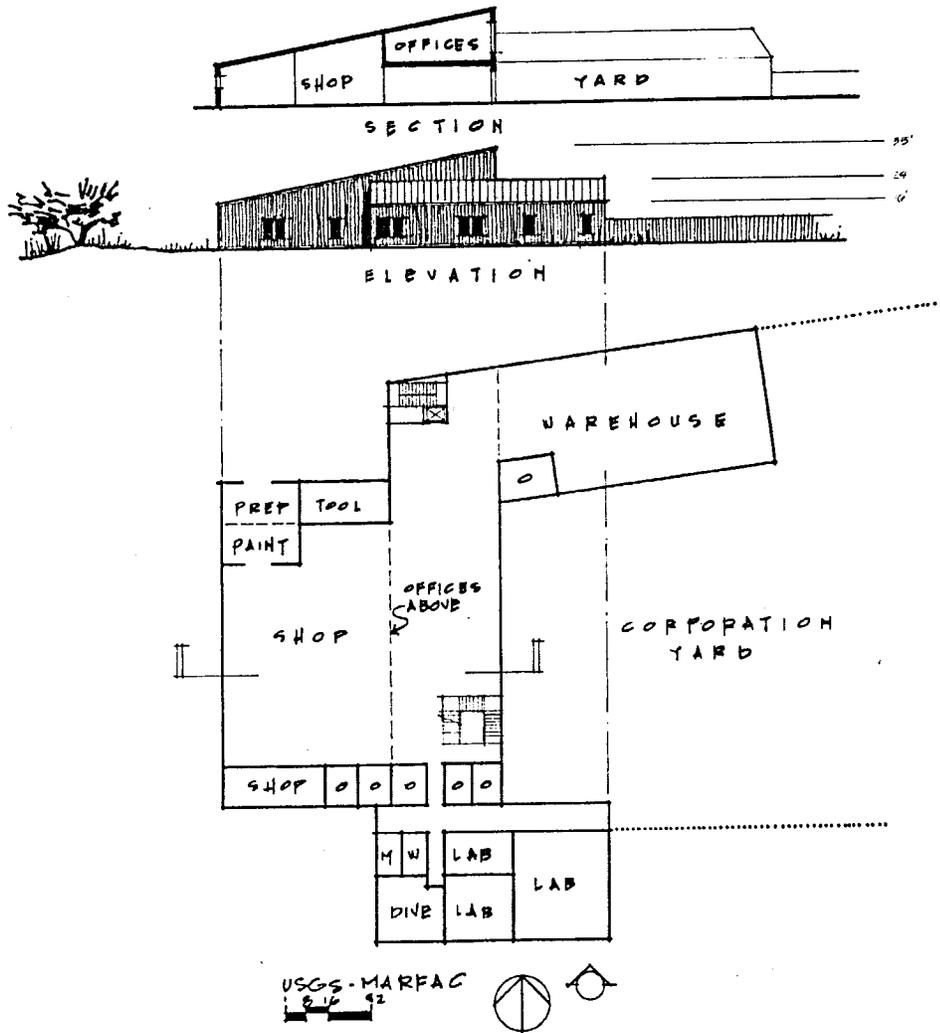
Shared Warehouse, Shop, and Laydown Facility
